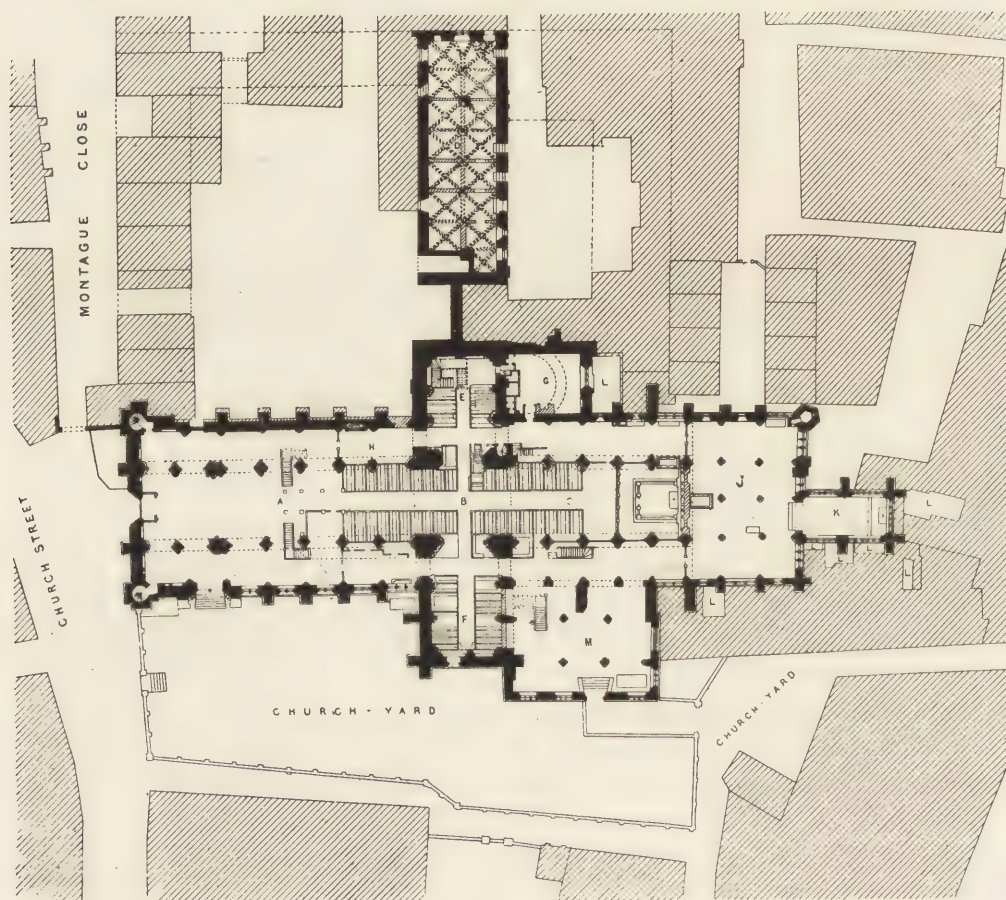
GROUND PLAN OF THE CHURCH AND SURROUNDINGS.
